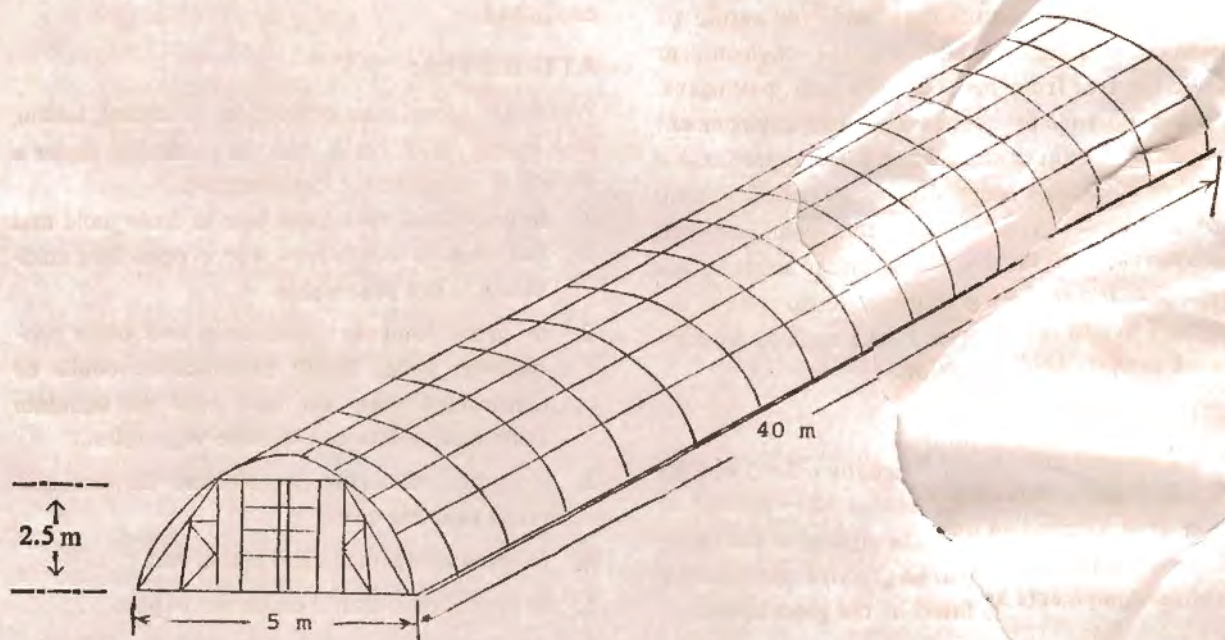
Schematic Diagram of Pipe Framed Greenhouse
